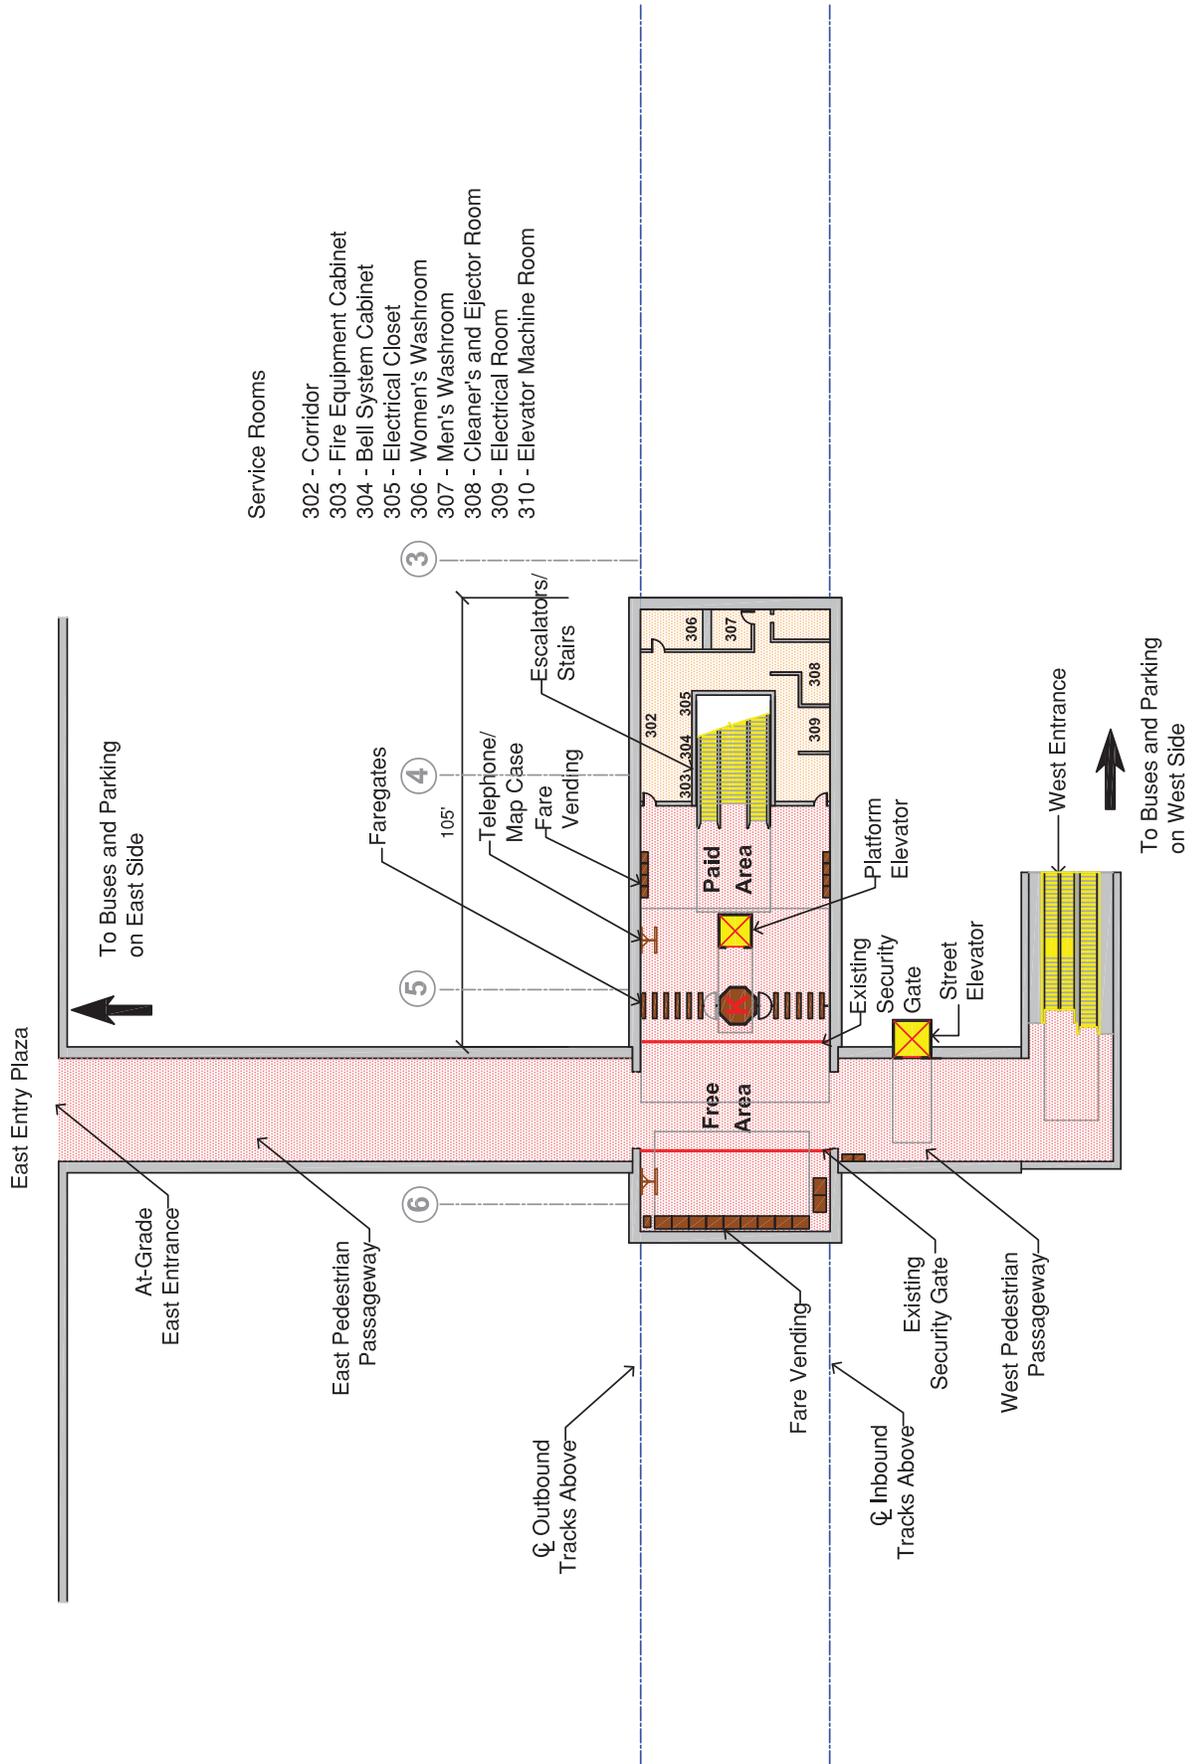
Existing Conditions - Mezzanine Plan (NTS)
